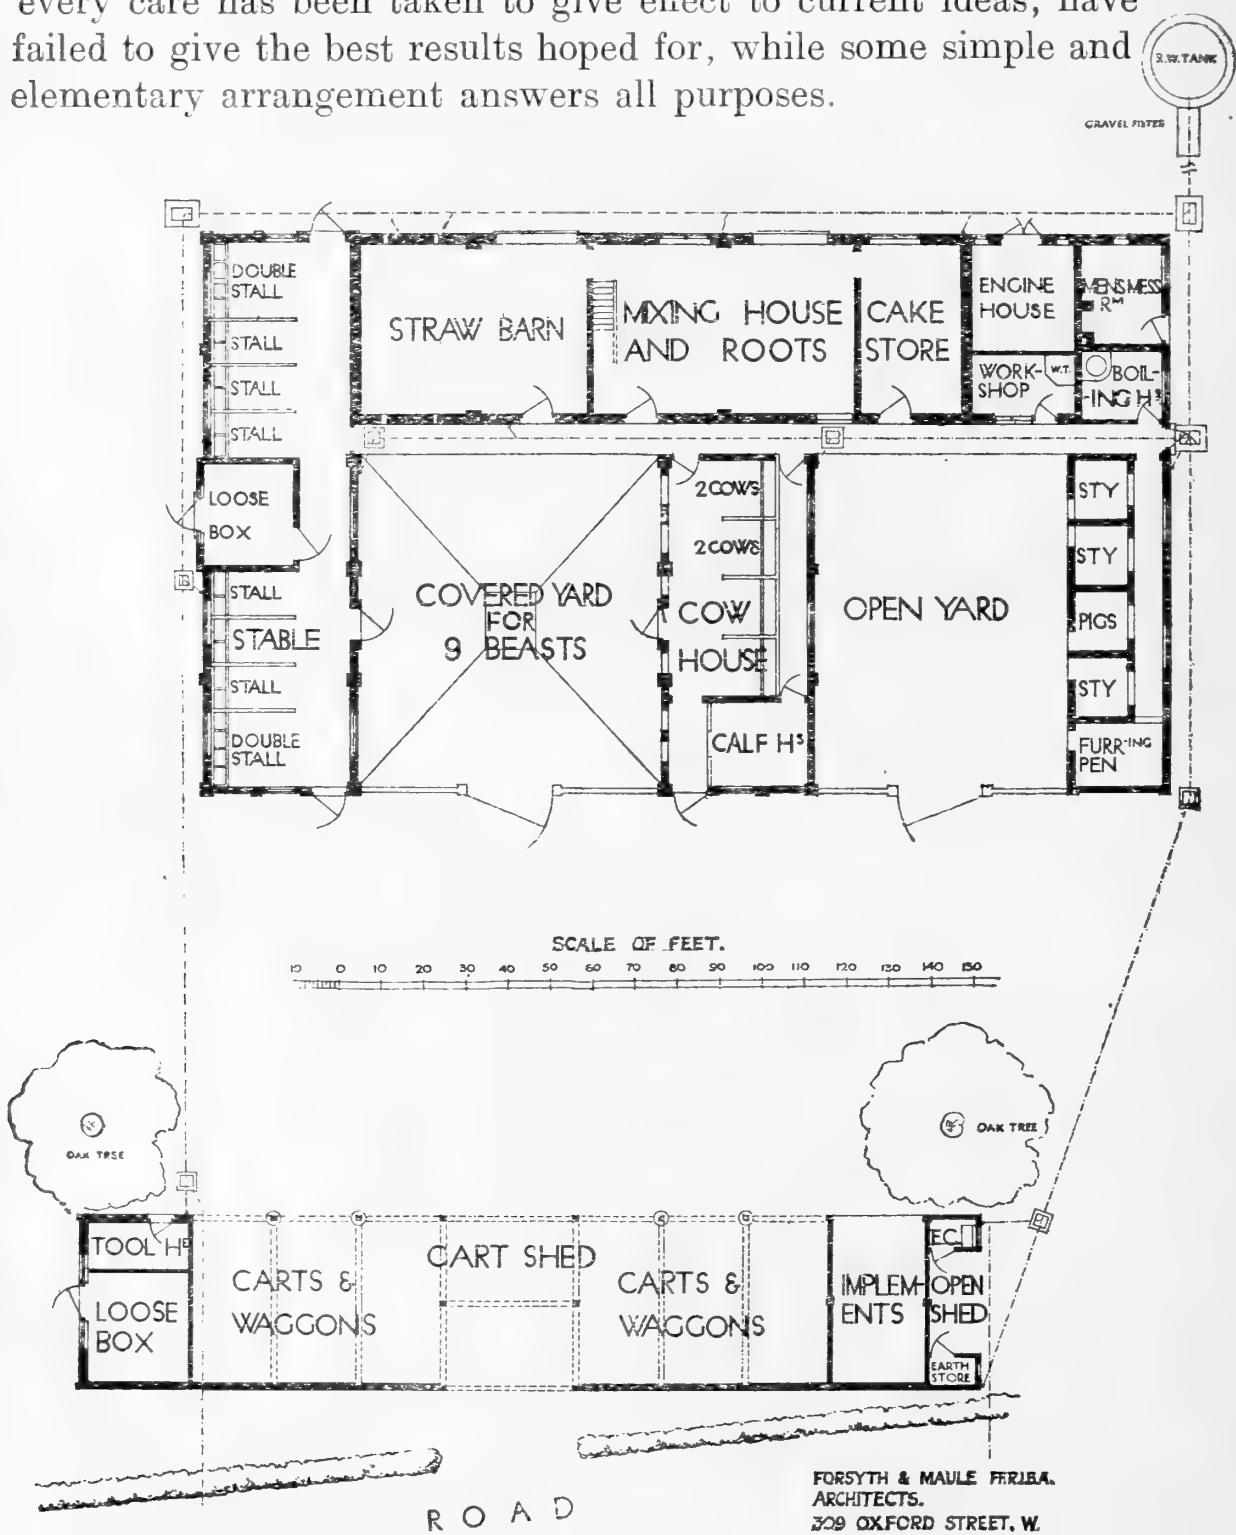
Plan of Farm Buildings, Newtown Farm, Lymington.
